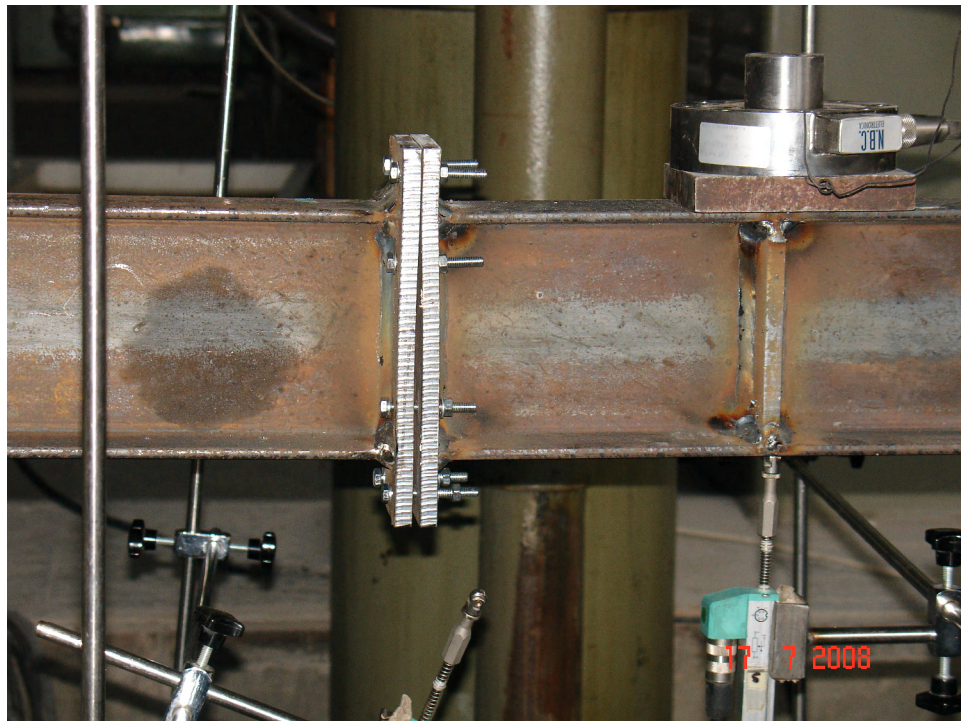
Photograph of Test 4 end plate splice after experiment
